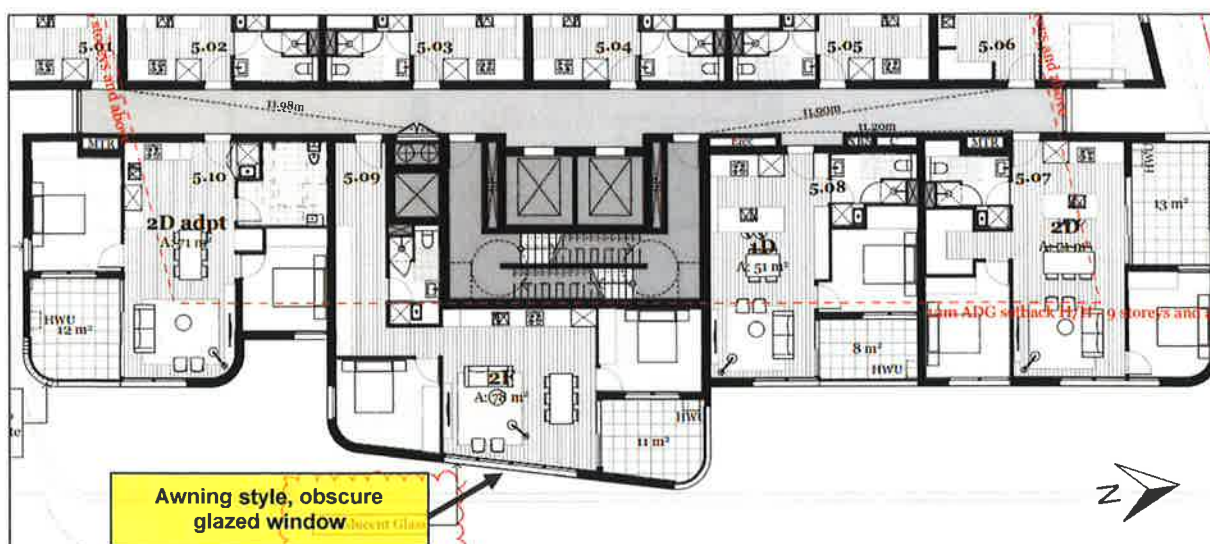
| Proposed privacy mitigation measures for east facing apartments (Base source: Architectural Plans)
